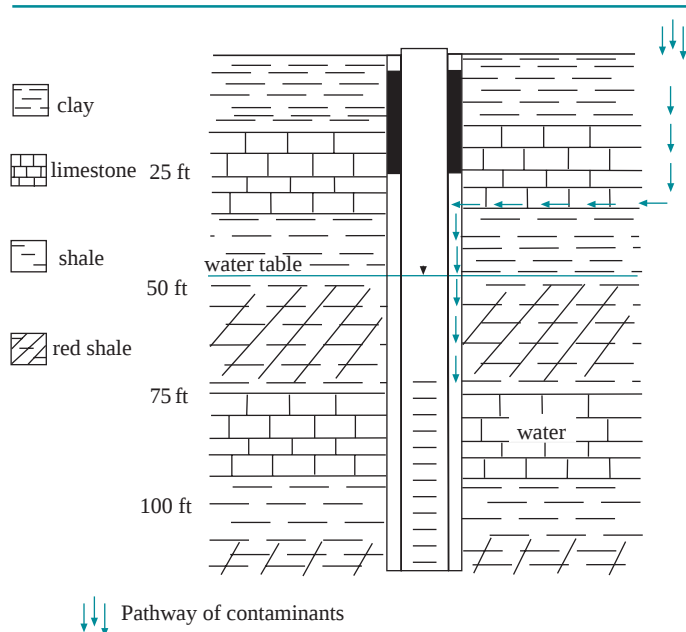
Cross-section Showing Well Construction Details of an Improperly Grouted Well.
